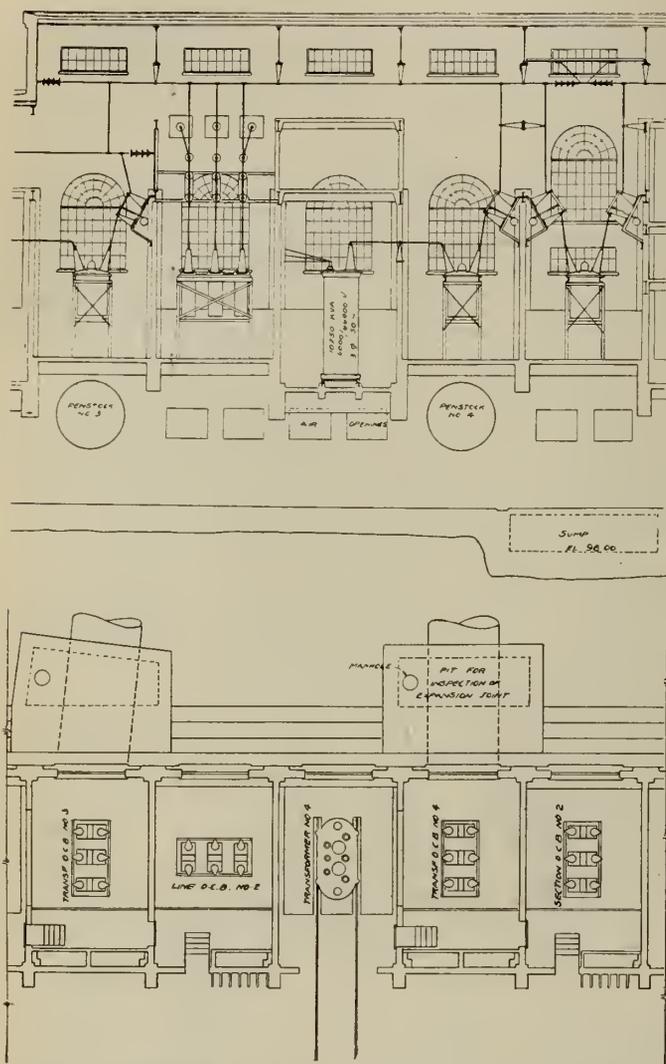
Typical Plan View and Elevation showing part of Switchhouse.
